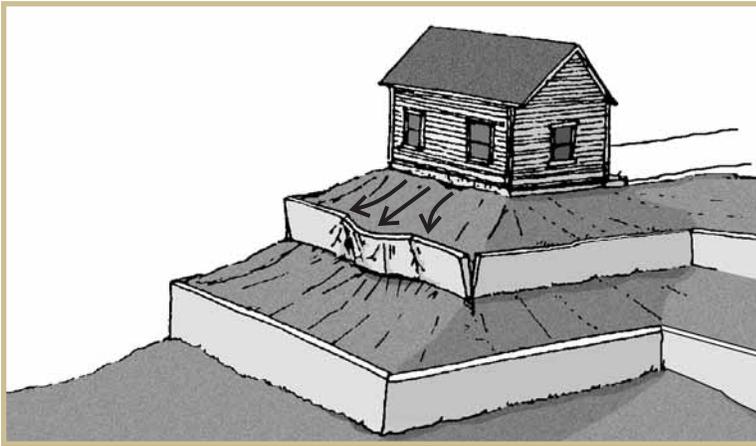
The design and construction of a retaining wall will determine the limits of what the wall can support. The arrows in this illustration show how the upper retaining wall is being pushed beyond its limits.
